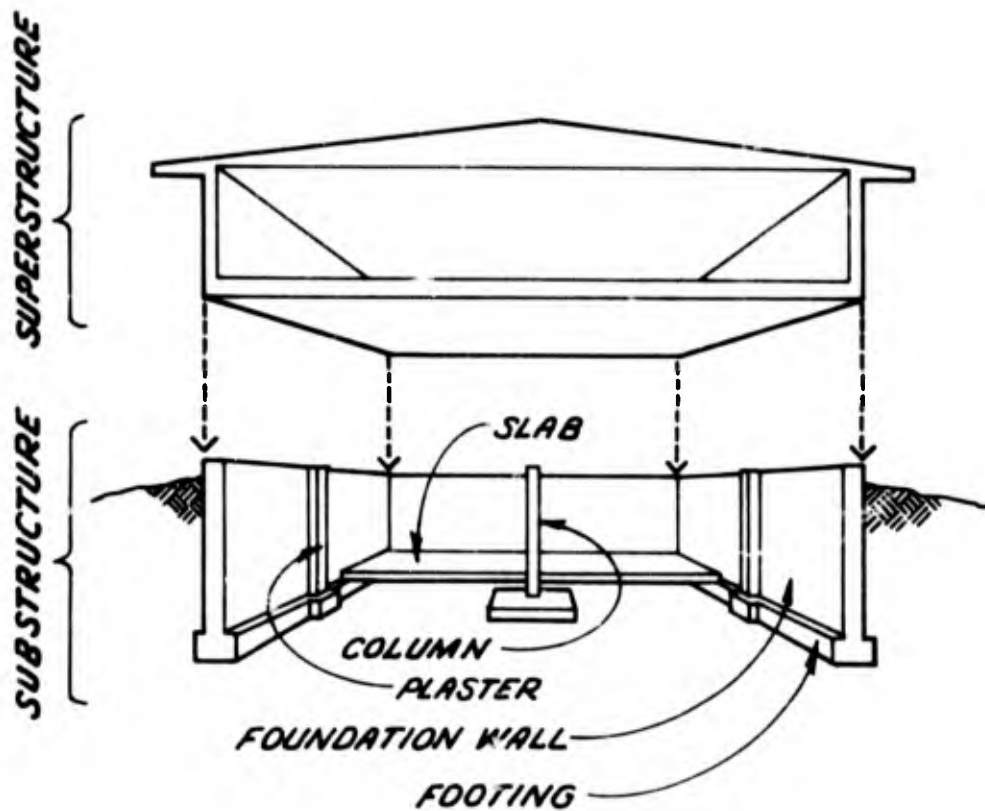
Substructure of a building. The superstructure loads are transmitted to the soil using foundation walls, pilasters, piers, columns, and footings. Other elements such as grade beams and piles may also be used but are not shown here.
